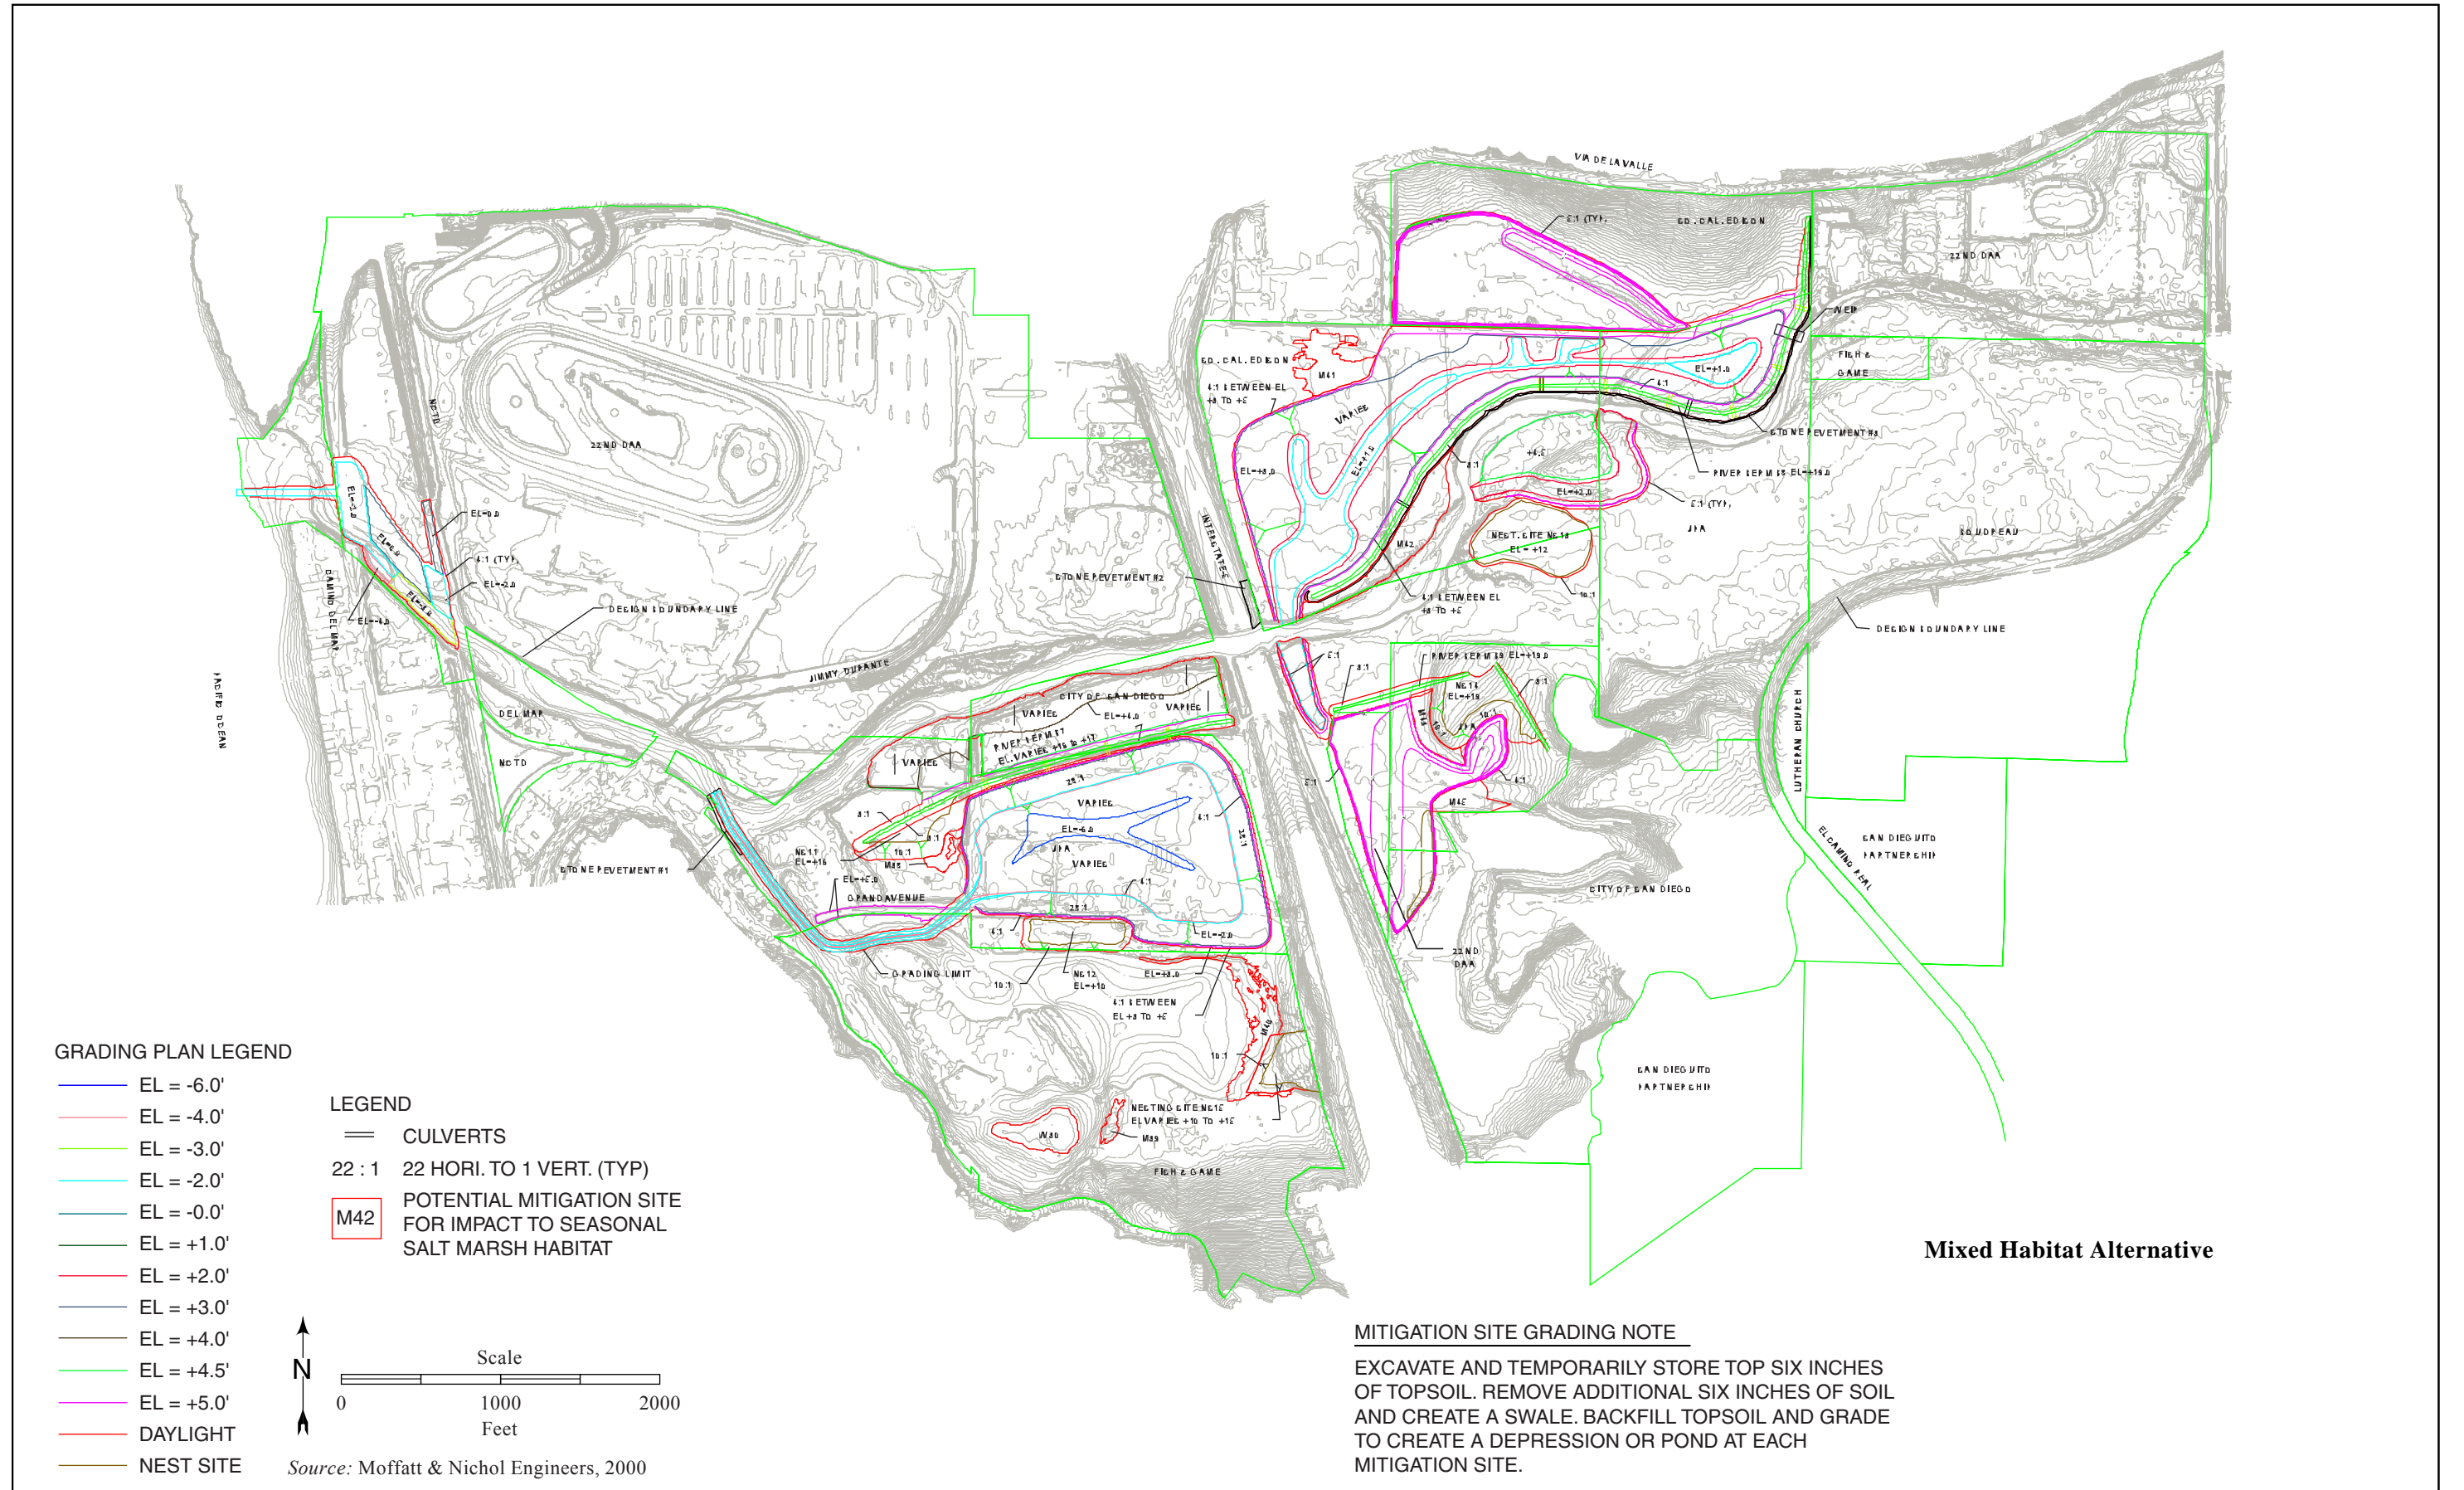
Plan View of Mixed Habitat Alternative
